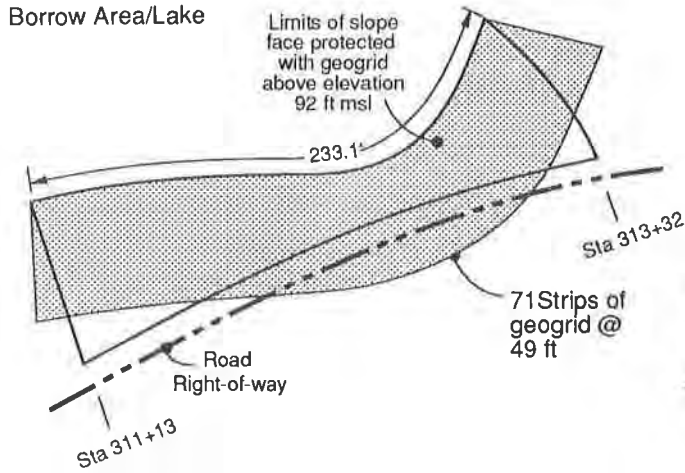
Typical geogrid layout plan for elevation +92.0 msl
